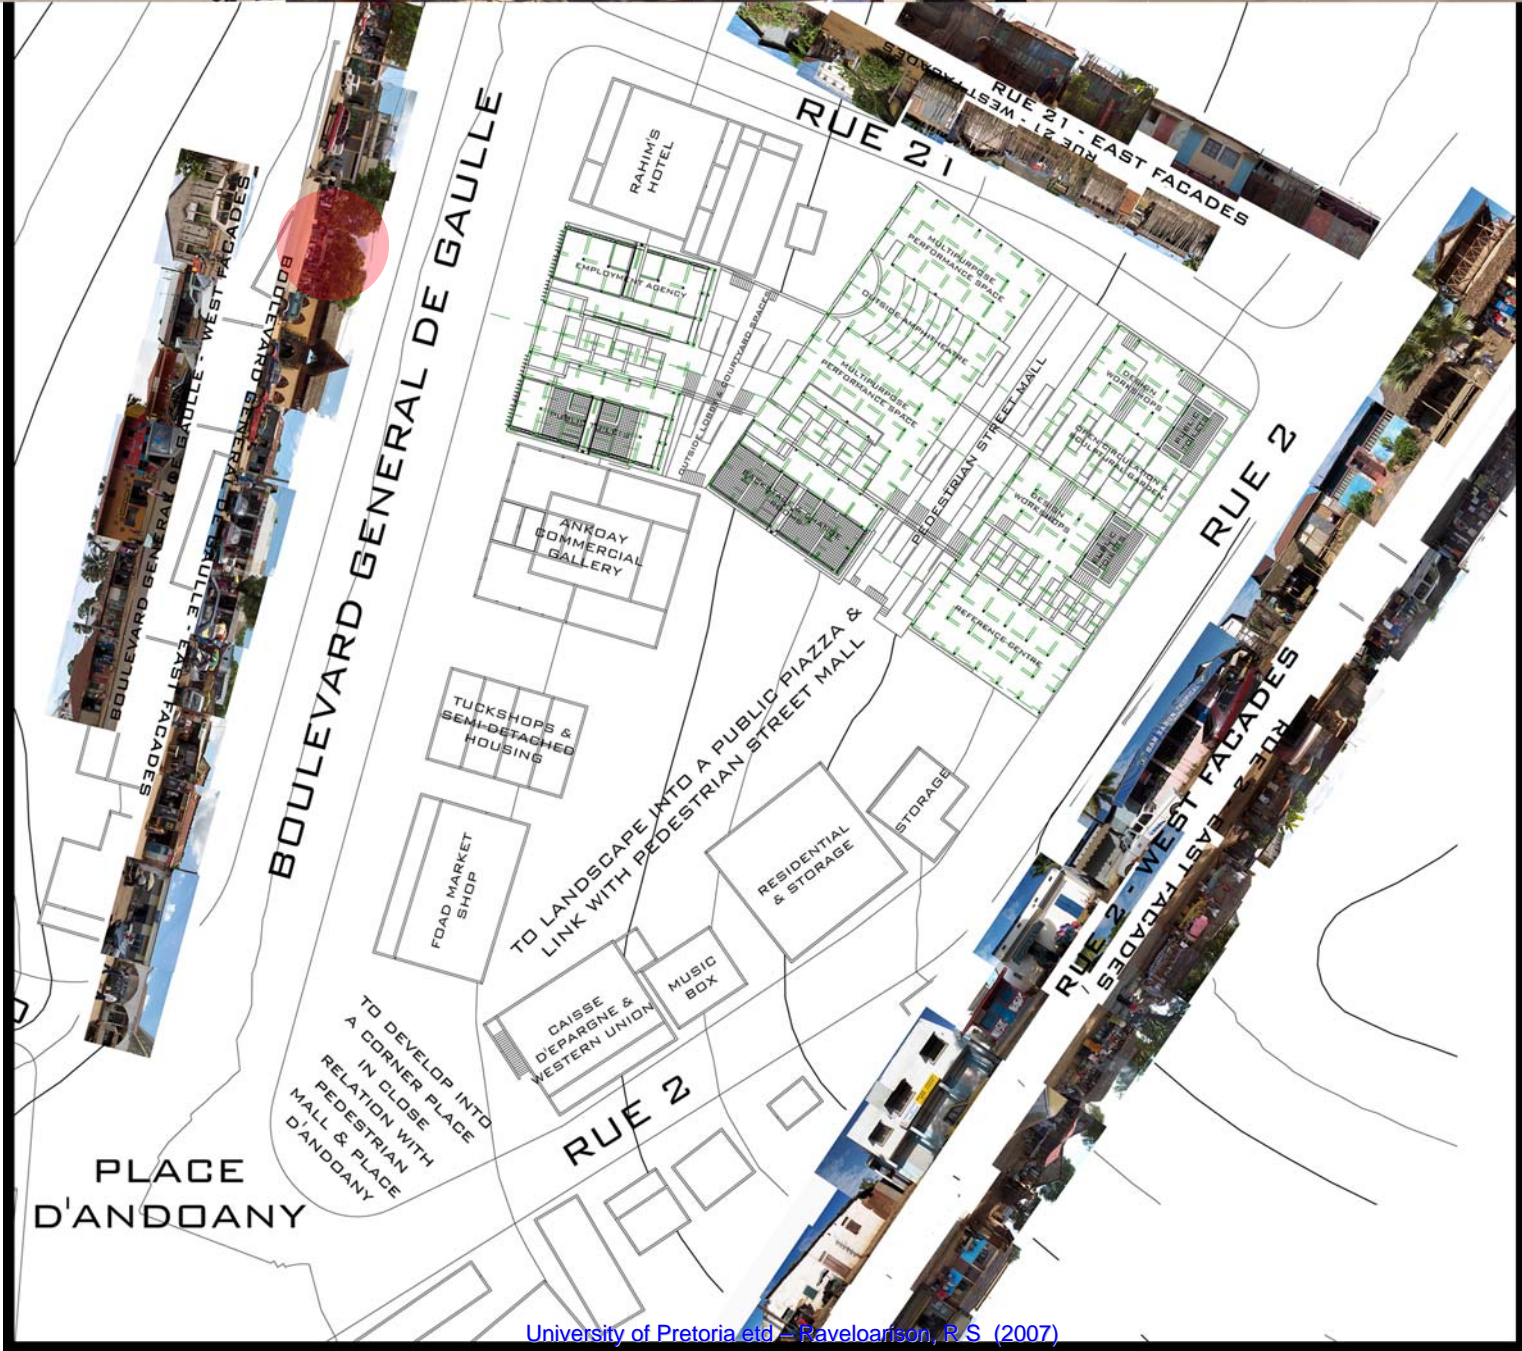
CONTEXT AND PROPOSED SITE PLAN (PHOTOS: AUTHOR, JANUARY & MARCH 2006).
